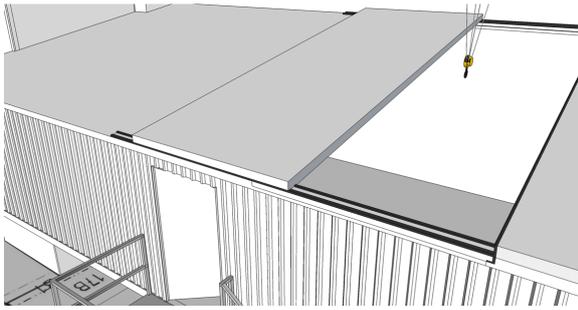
Layout of acoustic ceiling - partly removable (detail)
